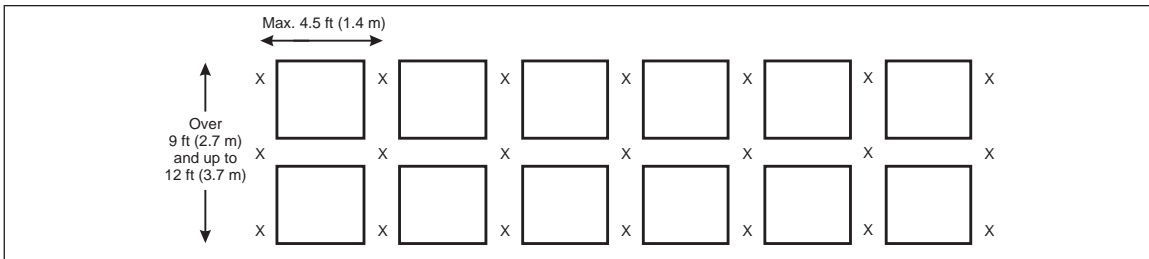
Plan view of alternative in-rack sprinkler arrangement for double-row racks up to 12 ft (3.7 m) deep
